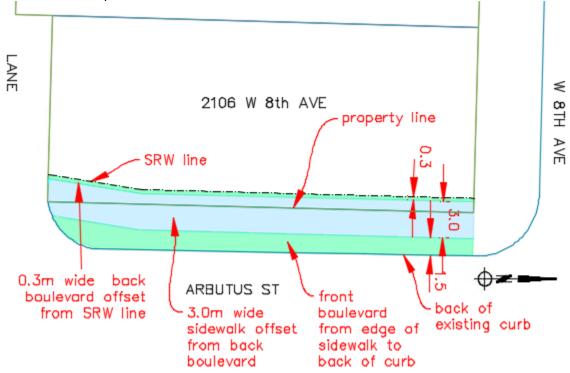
Explanatory plan indicating the requirements of Condition A.2.1 a, b, and c.
